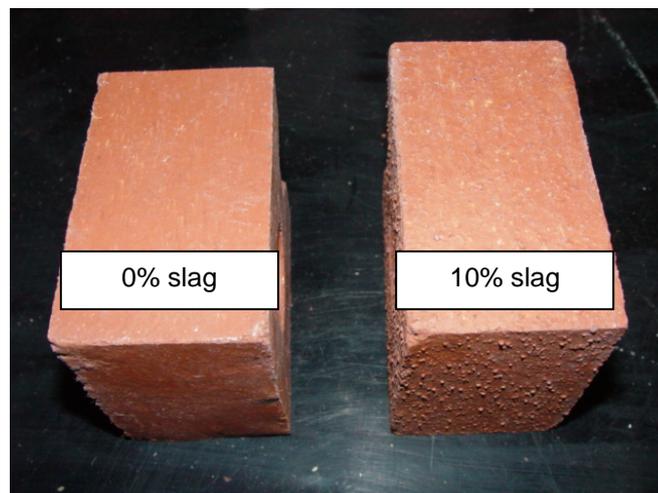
A close view of the surfaces of the conventional brick and a brick containing slag.
